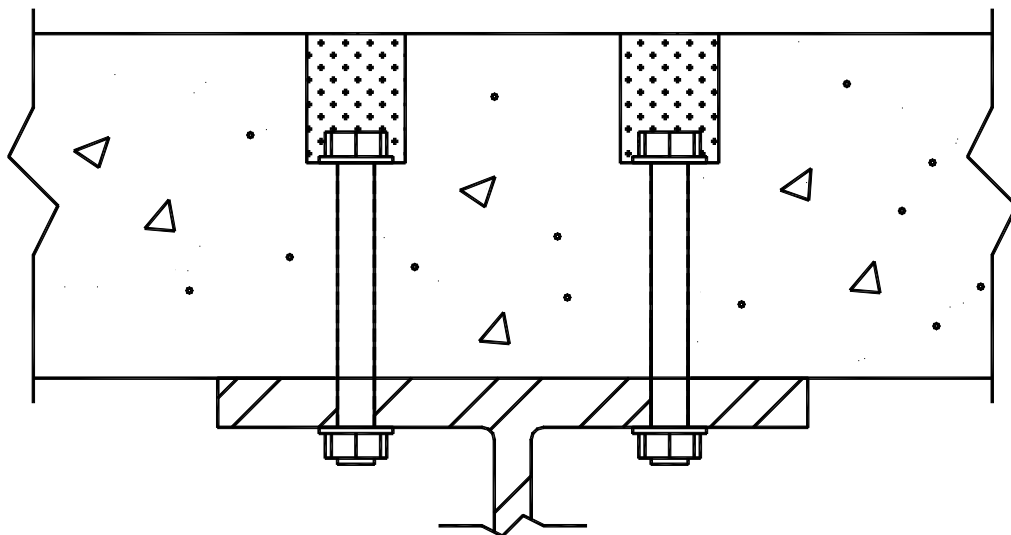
High-tension, friction-grip bolt (HTFGB)
